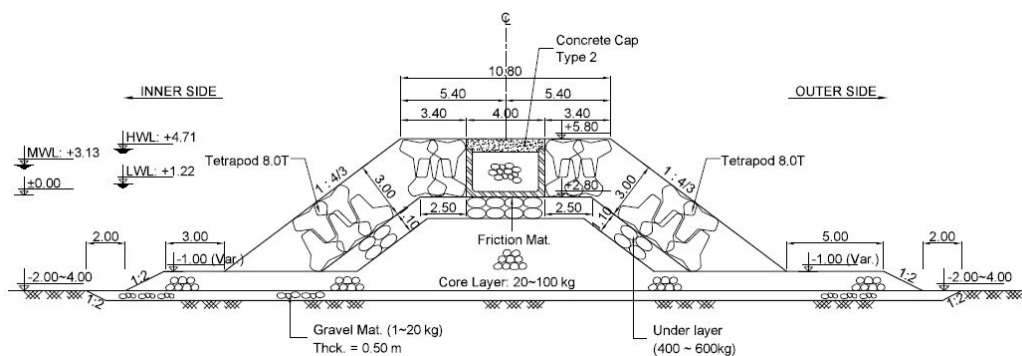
Typical Cross Section of Landside Breakwater in Tra Vinh
